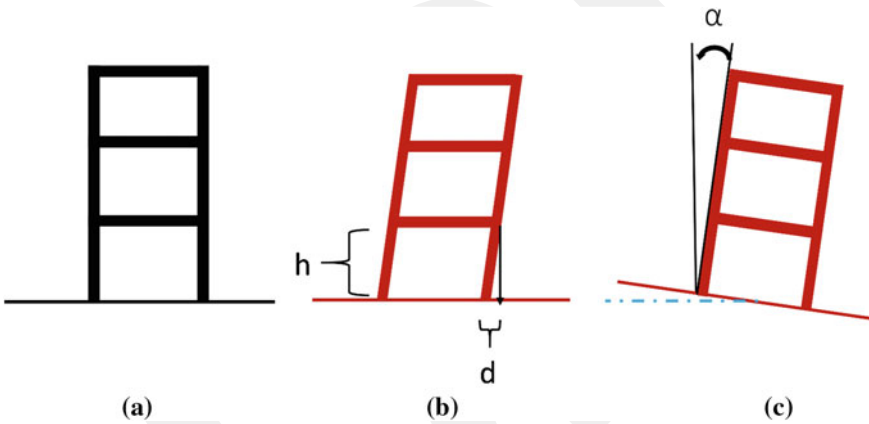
a undamaged building; b building with residual drift; c tilted building
